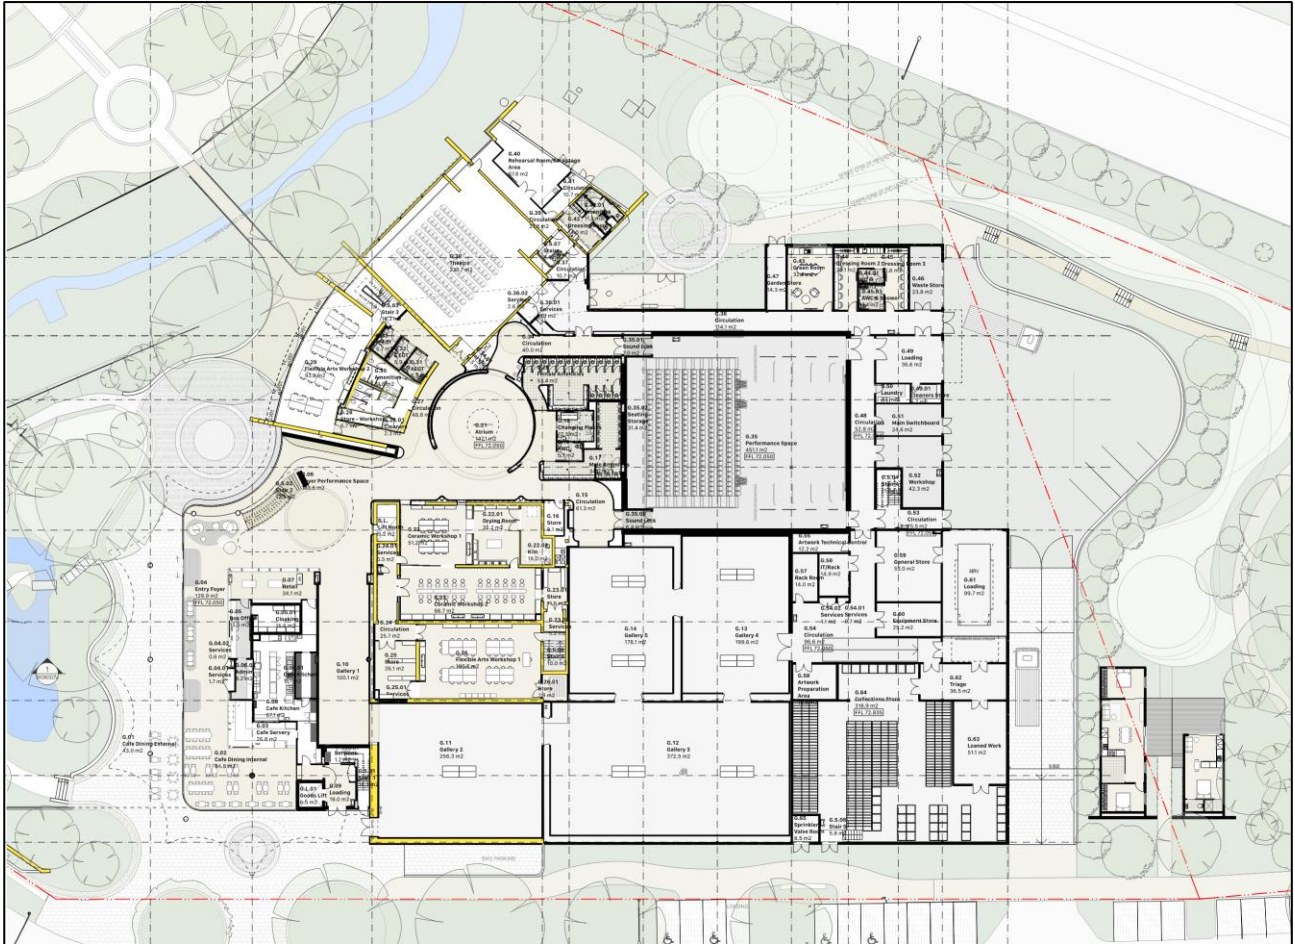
Ground floor plan for the site (Source: FJC Studio, Sheet 2000 Rev 12, dated 16 April 2026)
